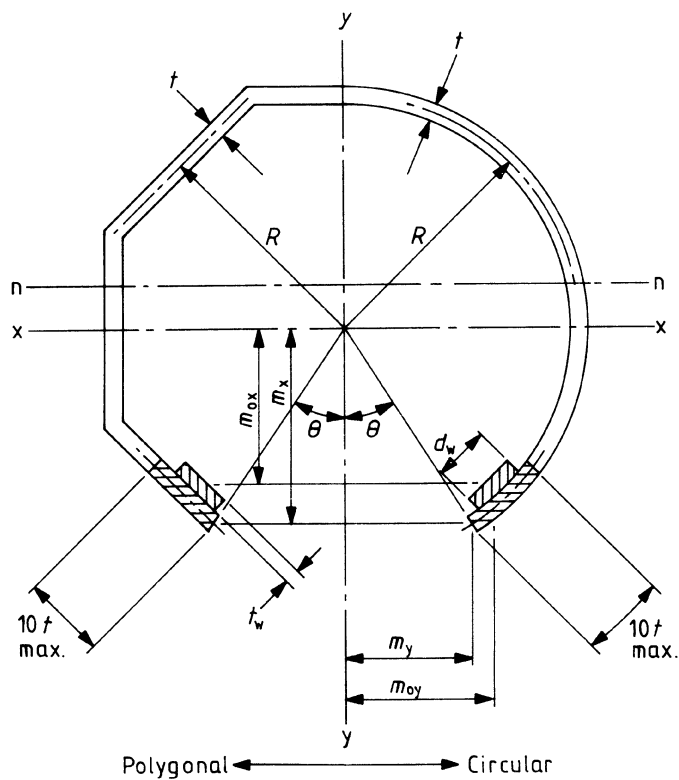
Cross sections of reinforced door openings in metal lighting columns
